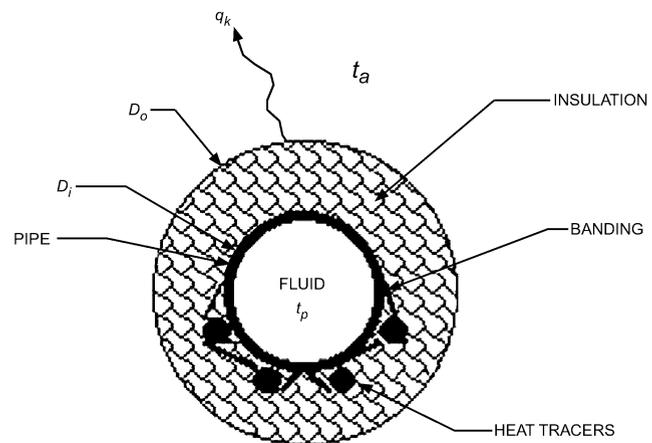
Typical Heat Tracing Arrangement (Hydronic or Electric)
